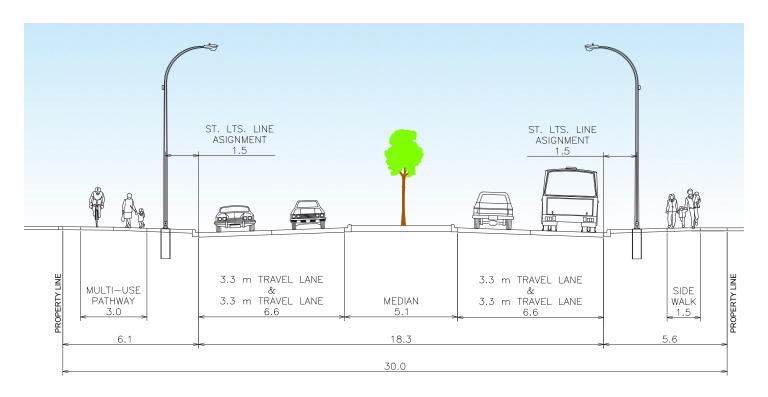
Conceptual Road Cross Section 47th Street at 24th Avenue
